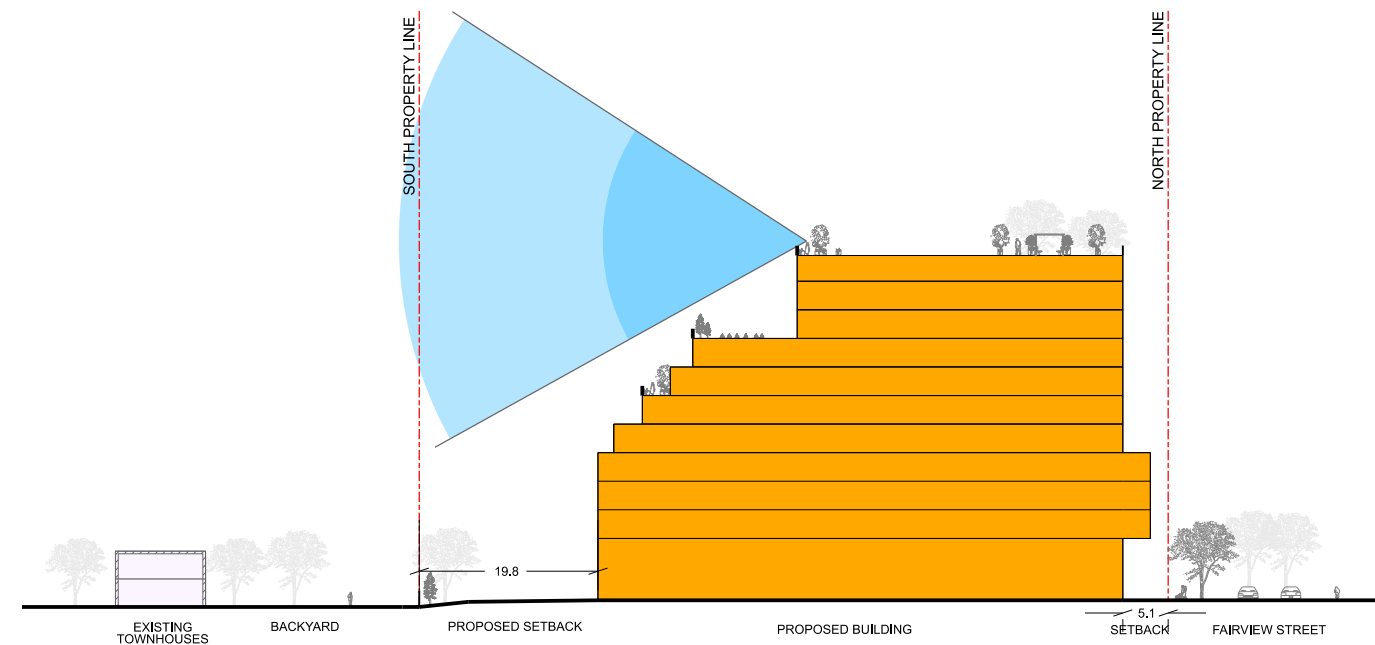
Cross-Section illustrating the Building Setback From the Existing Townhouse Property to the South and Privacy View Shed
